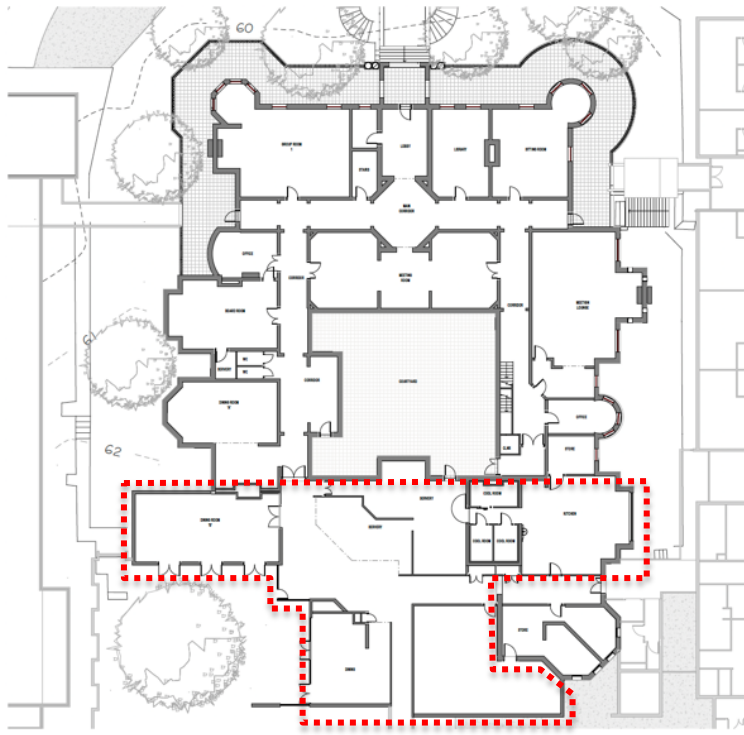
EXISTING GROUND FLOOR PLAN. Food Services Unit outlined in red.
